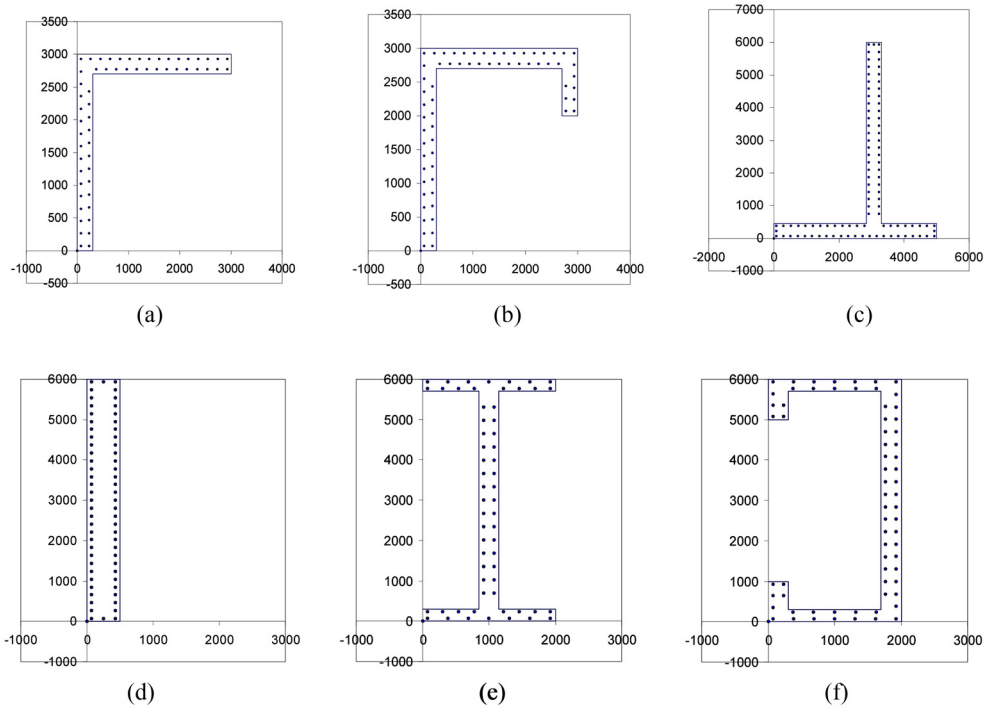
(a)-(f) Spreadsheet images of wall cross-sections
